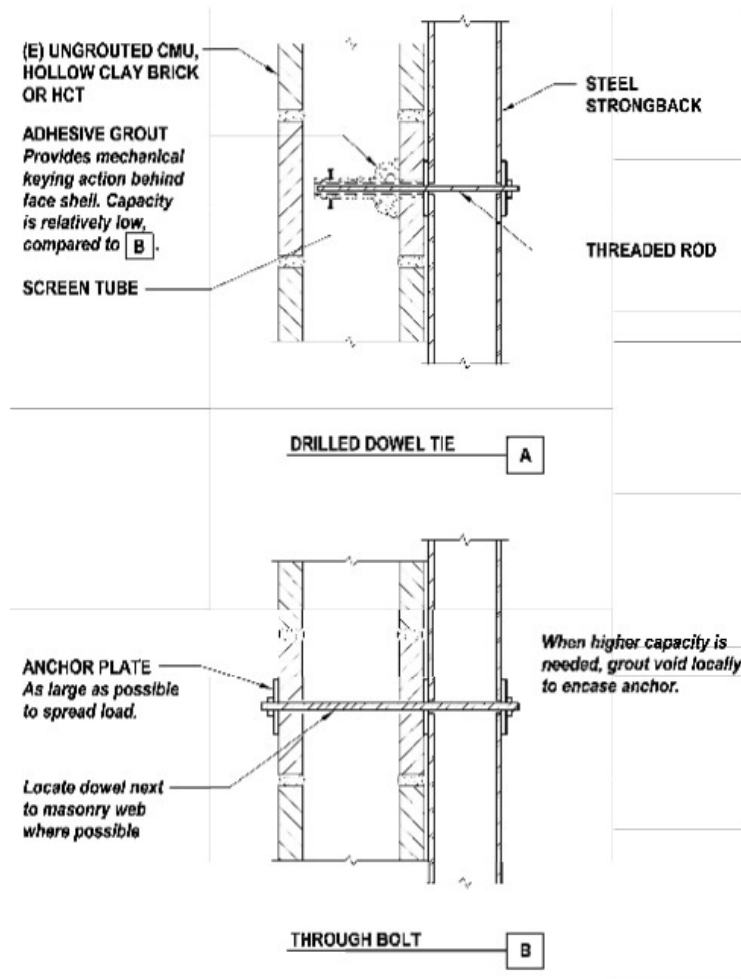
Connection of Strongback to Hollow Masonry
